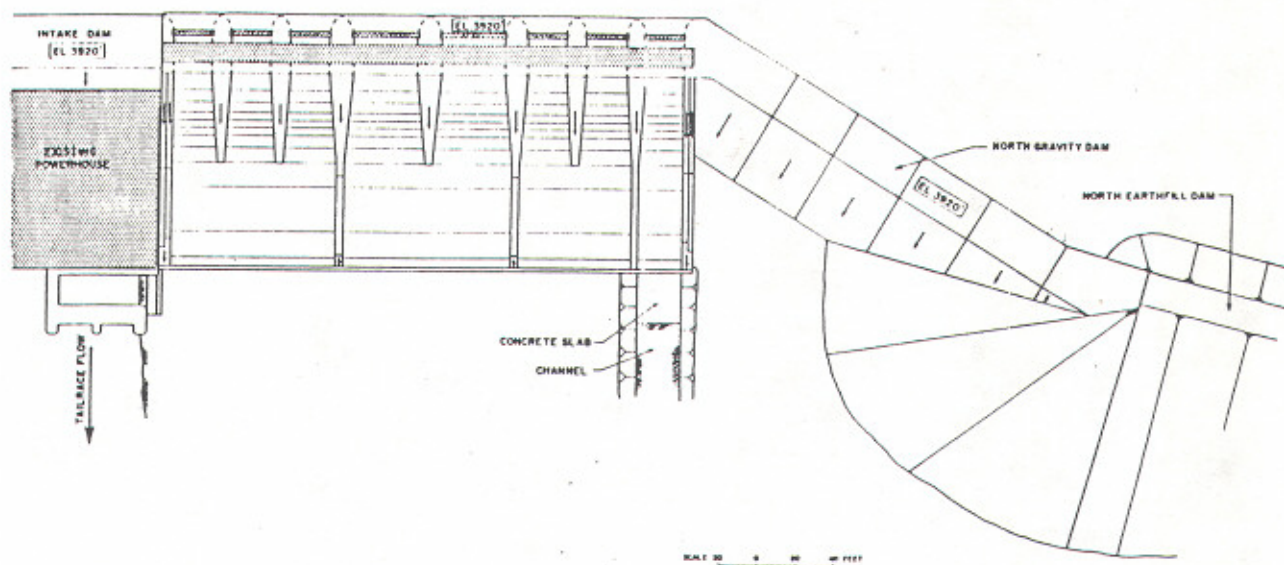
PLAN, NEW GHOST SPILLWAY
